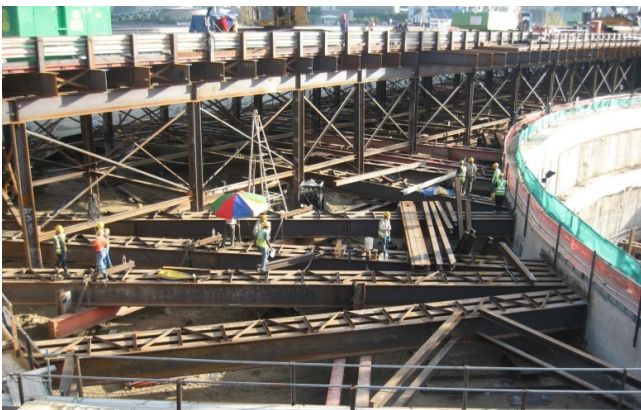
View of the prop between the perimeter wall and the 120m diameter circular wall
